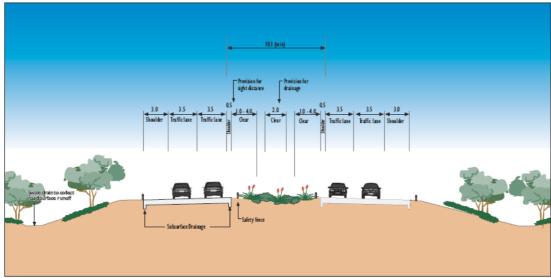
Typical four lane cross-section of the Tugun Bypass
